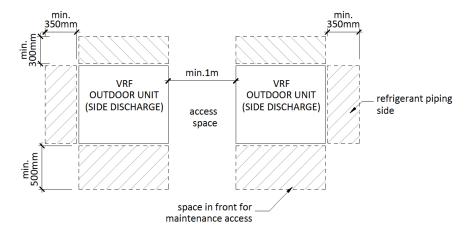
Space requirement for collective VRF outdoor unit (side discharge) - top view
